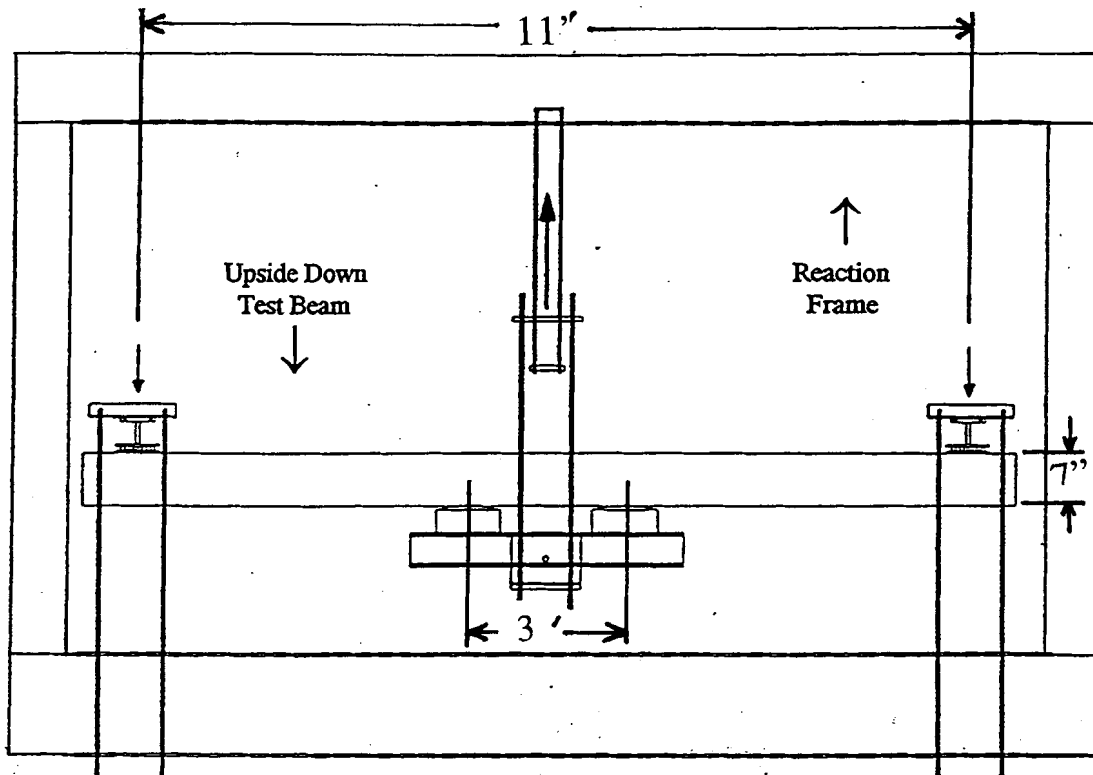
Elevation View of Test Setup: Test Beam, Load Head, Supports
